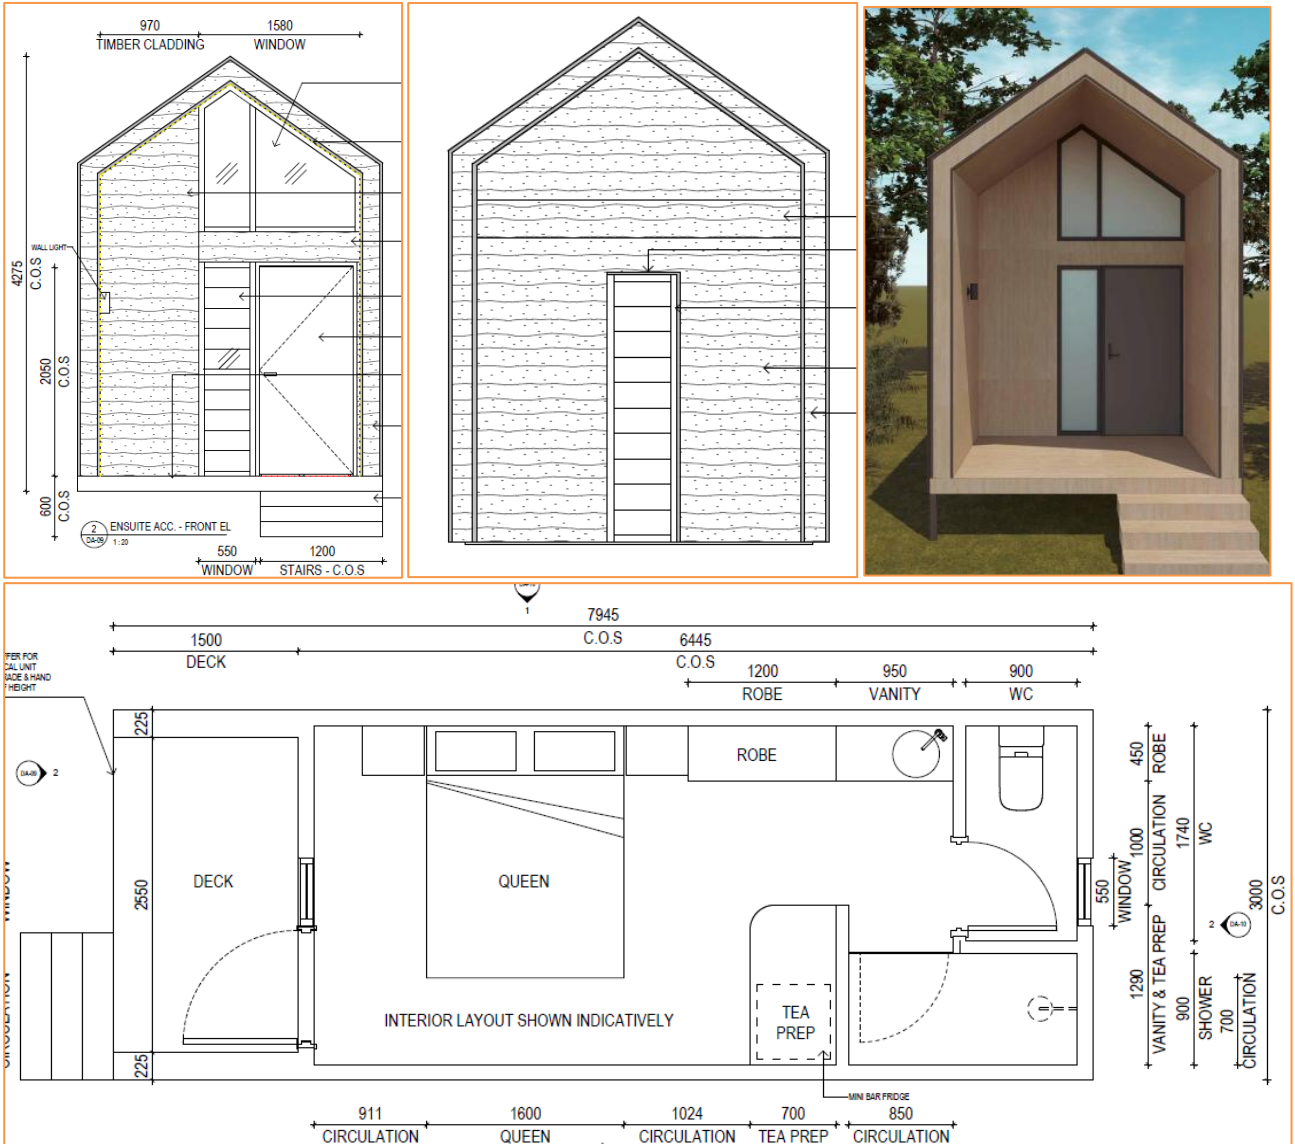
Typical 6-Pax Accommodation – Floor Plan and Front and Rear Elevations
